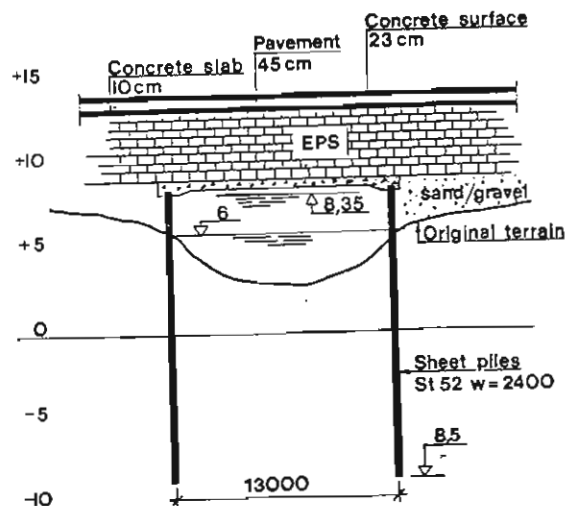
Nordre Tem bridge. details of sheet pile wall with EPS on top.
